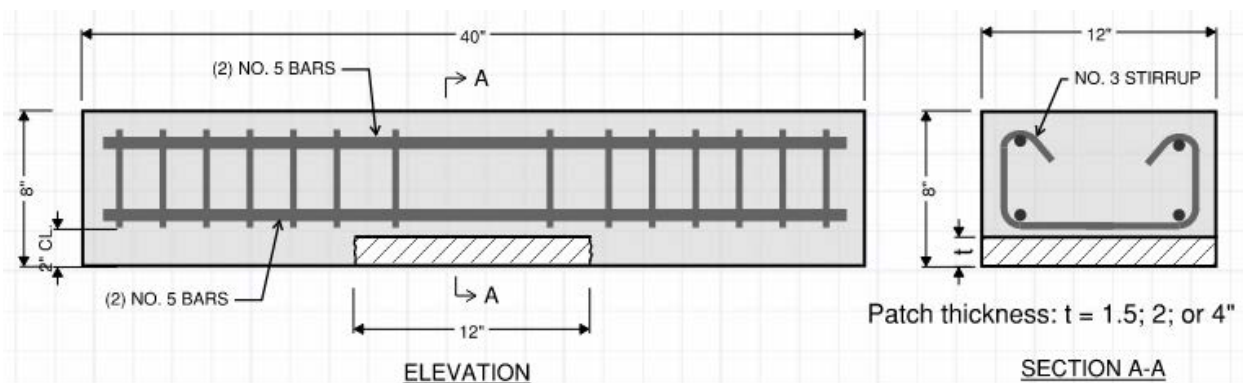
Specimen for thermal and load testing. (Notes: supplemental anchorage and reinforcement in the patch not shown; typical patch length is 12 inches unless otherwise noted).
